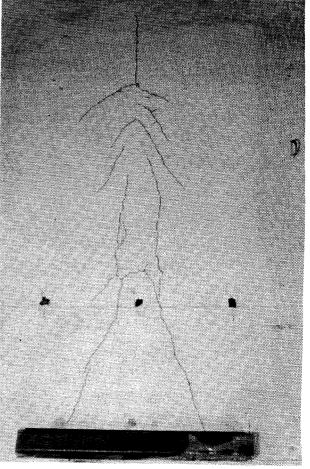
Crack Pattern in Southern Half of Slab of Full-Size Stub-Girder
